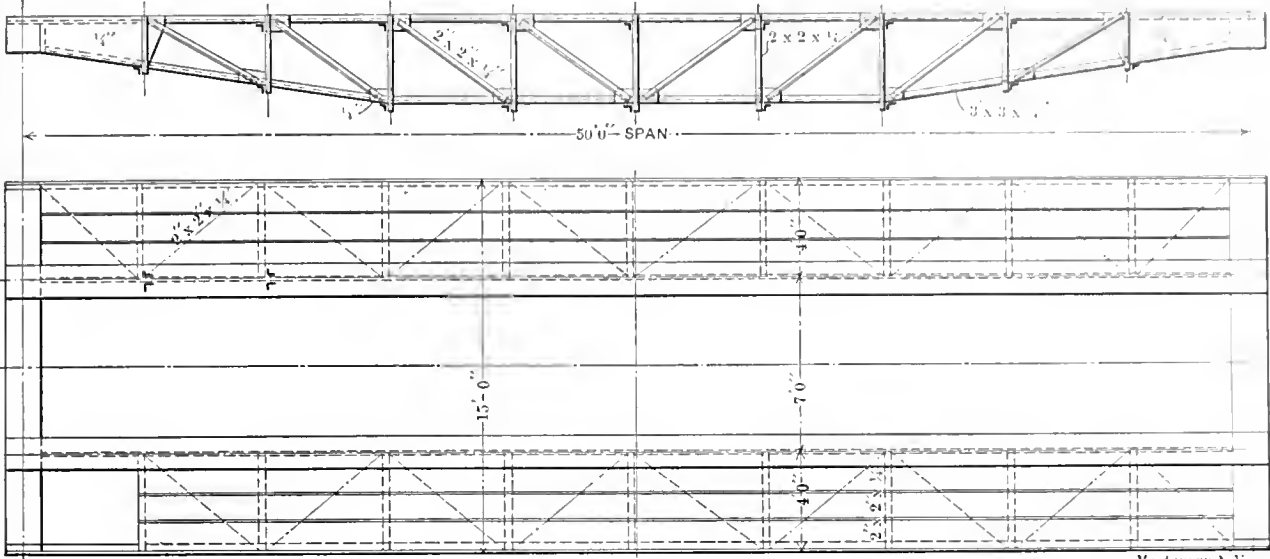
Web-plate Girder with Braced Platform Girder, added to insure Sufficient Strength for Wide Spans
